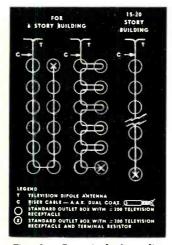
A typical riser diagram for installation in multiple dwellings. Circuit shown is applicable where the coaxial cables are actually run in conduit.
